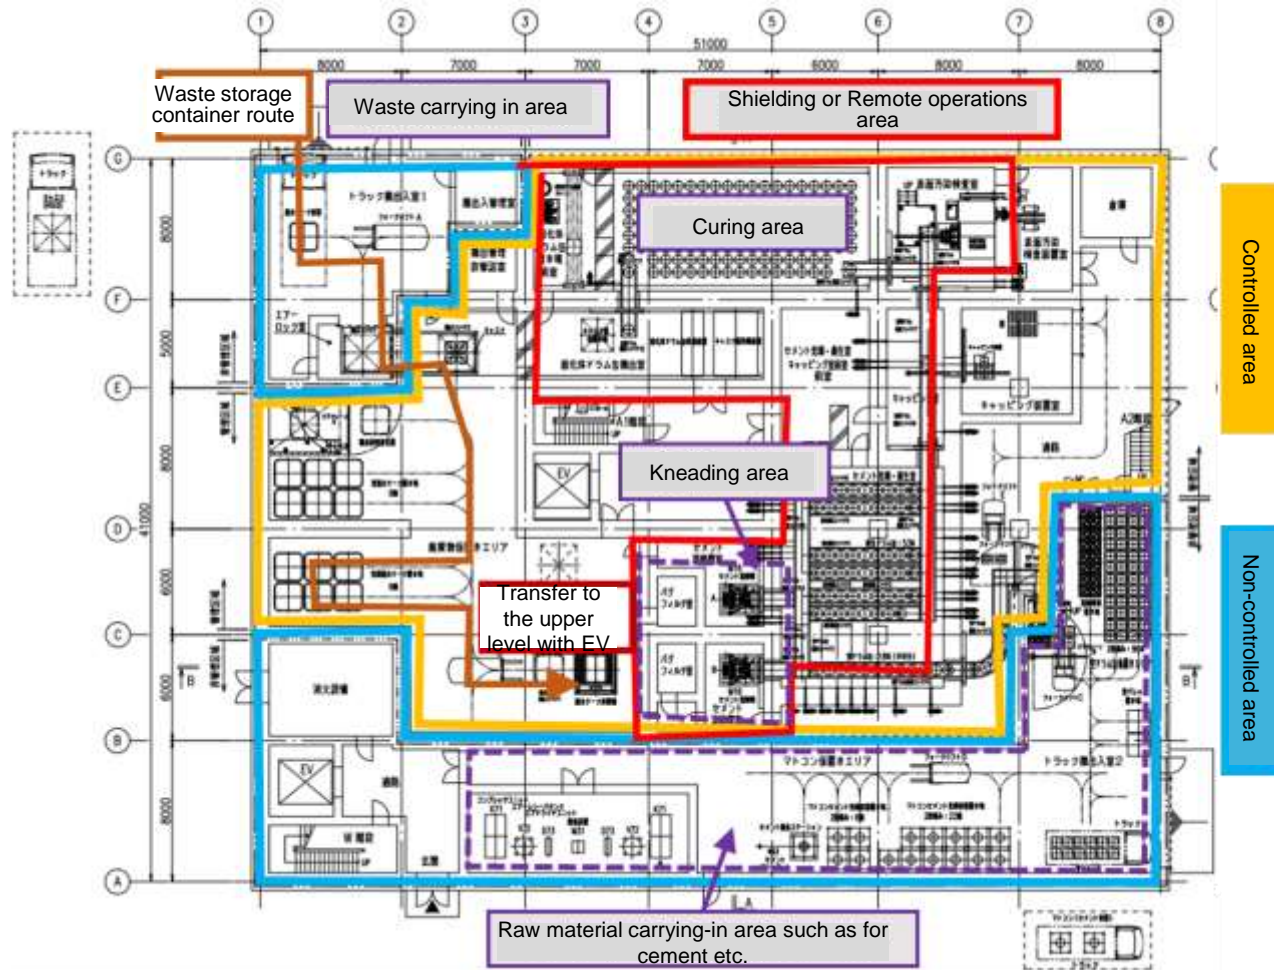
Equipment layout plan for remote in-drum type cement solidification treatment
